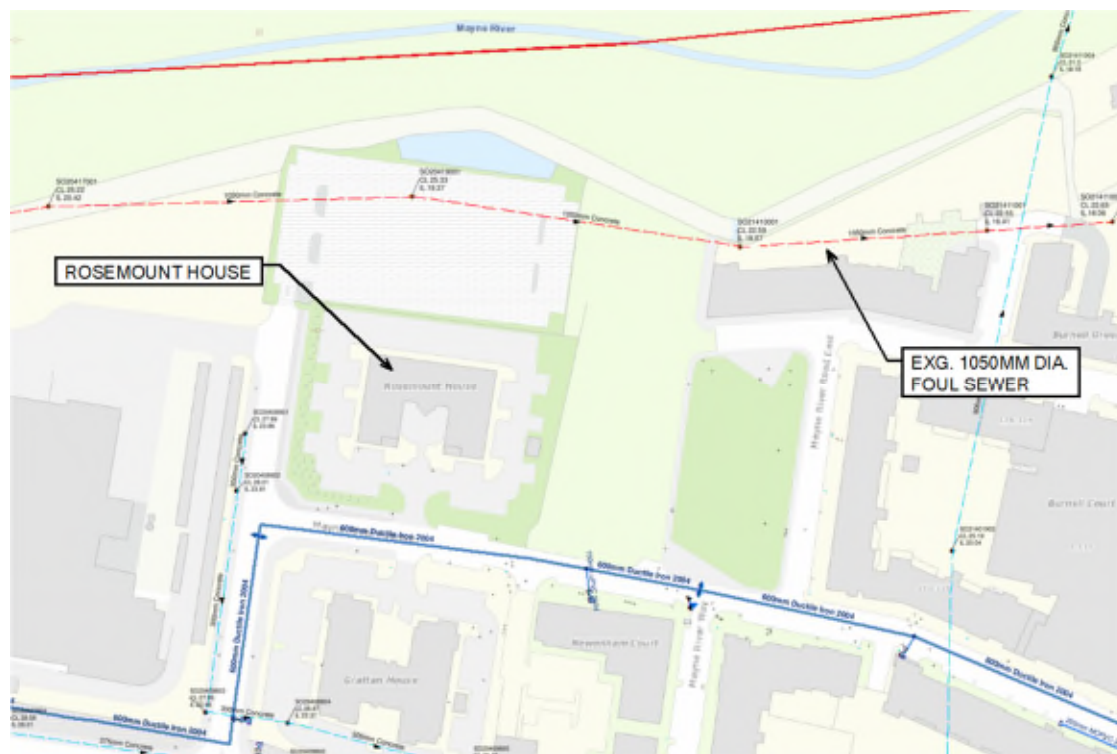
Extract from Irish Water Network Plan – Existing Foul Drainage Infrastructure
